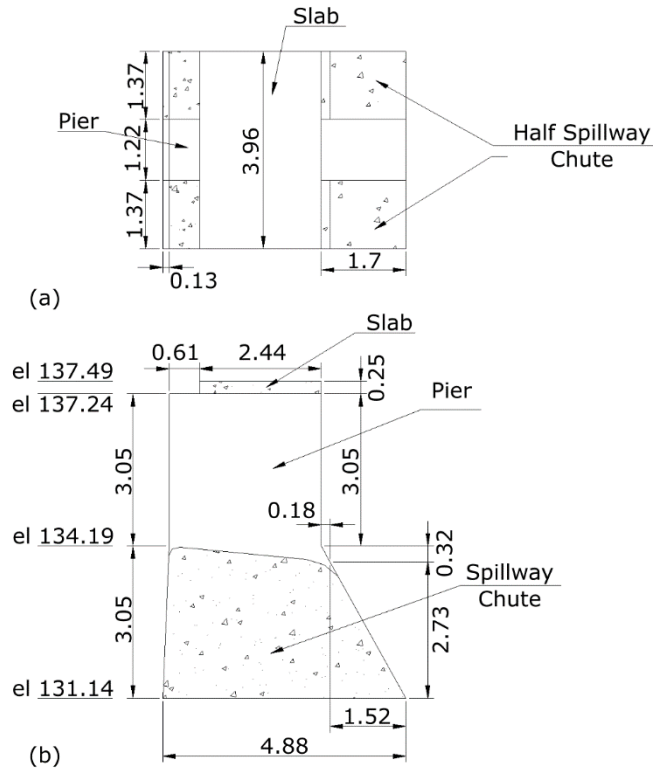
Chute Garneau blueprints: (a) plan view and (b) elevation dimensions
